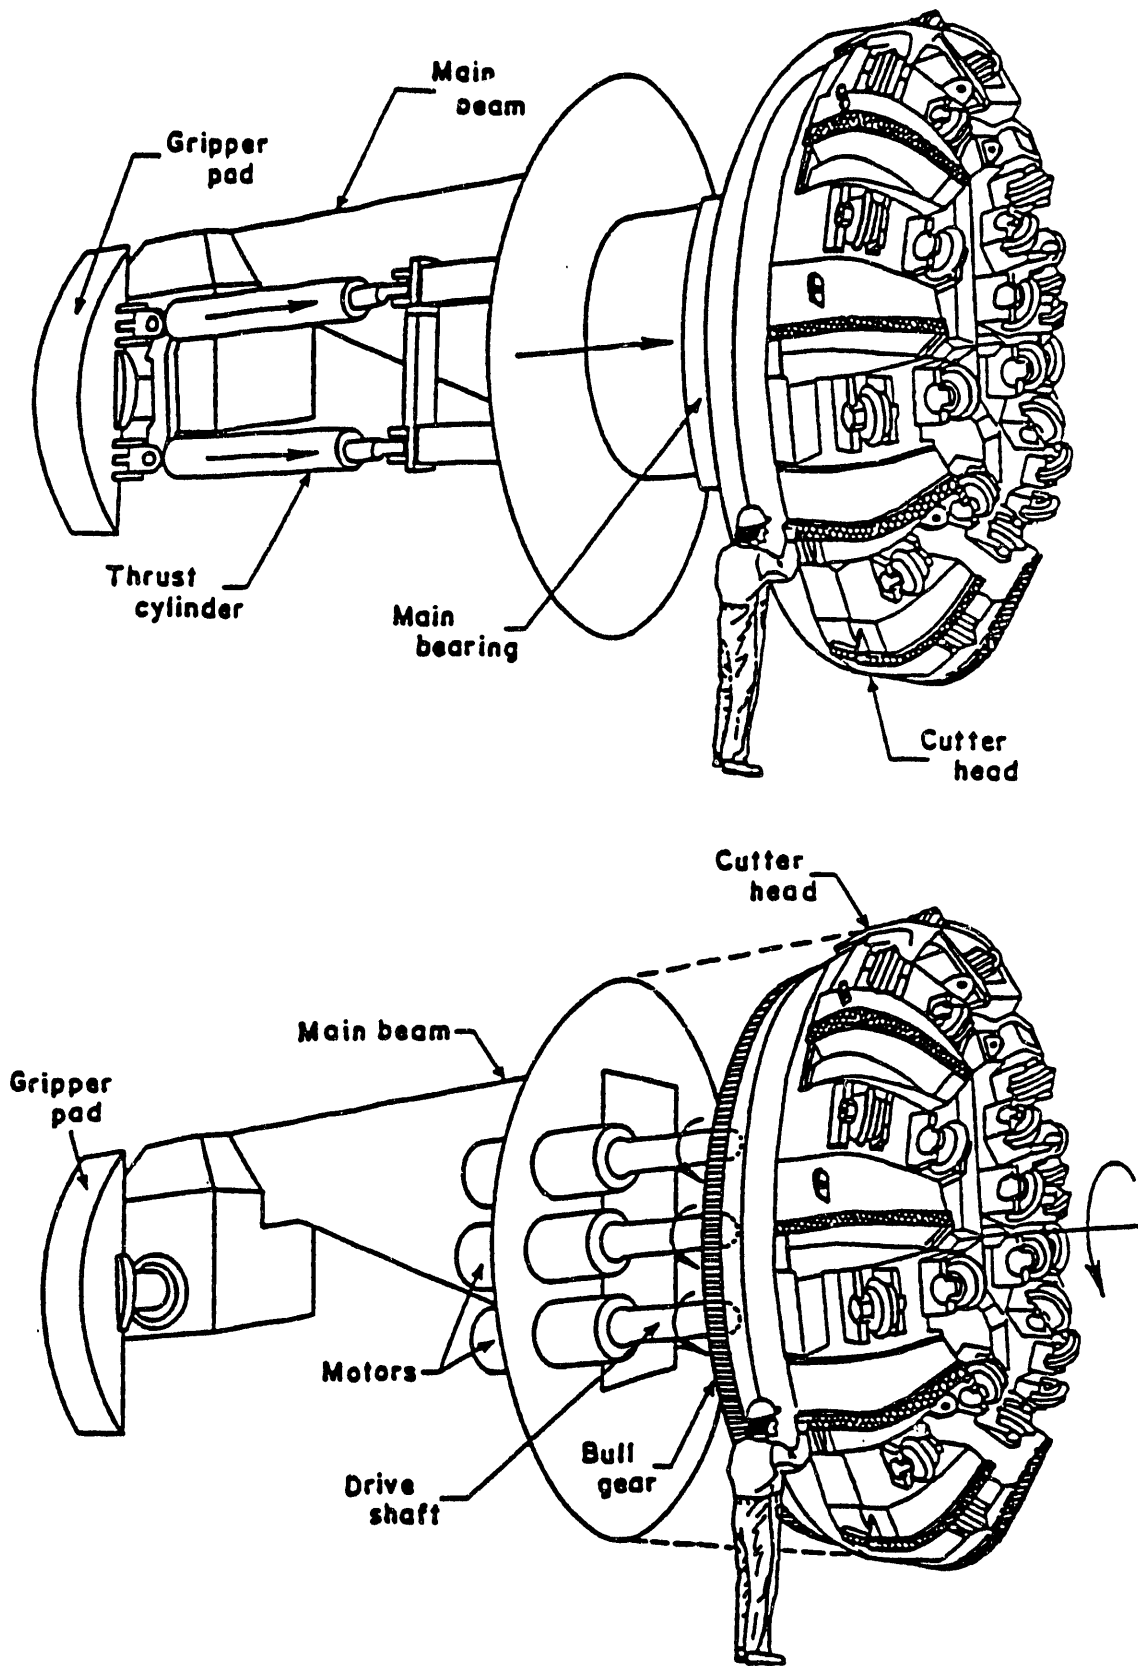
Schematic Drawing of Generic Thrust and Torque Systems of a Tunnel Boring Machine (TBM), Courtesy of The Robbins Co.
